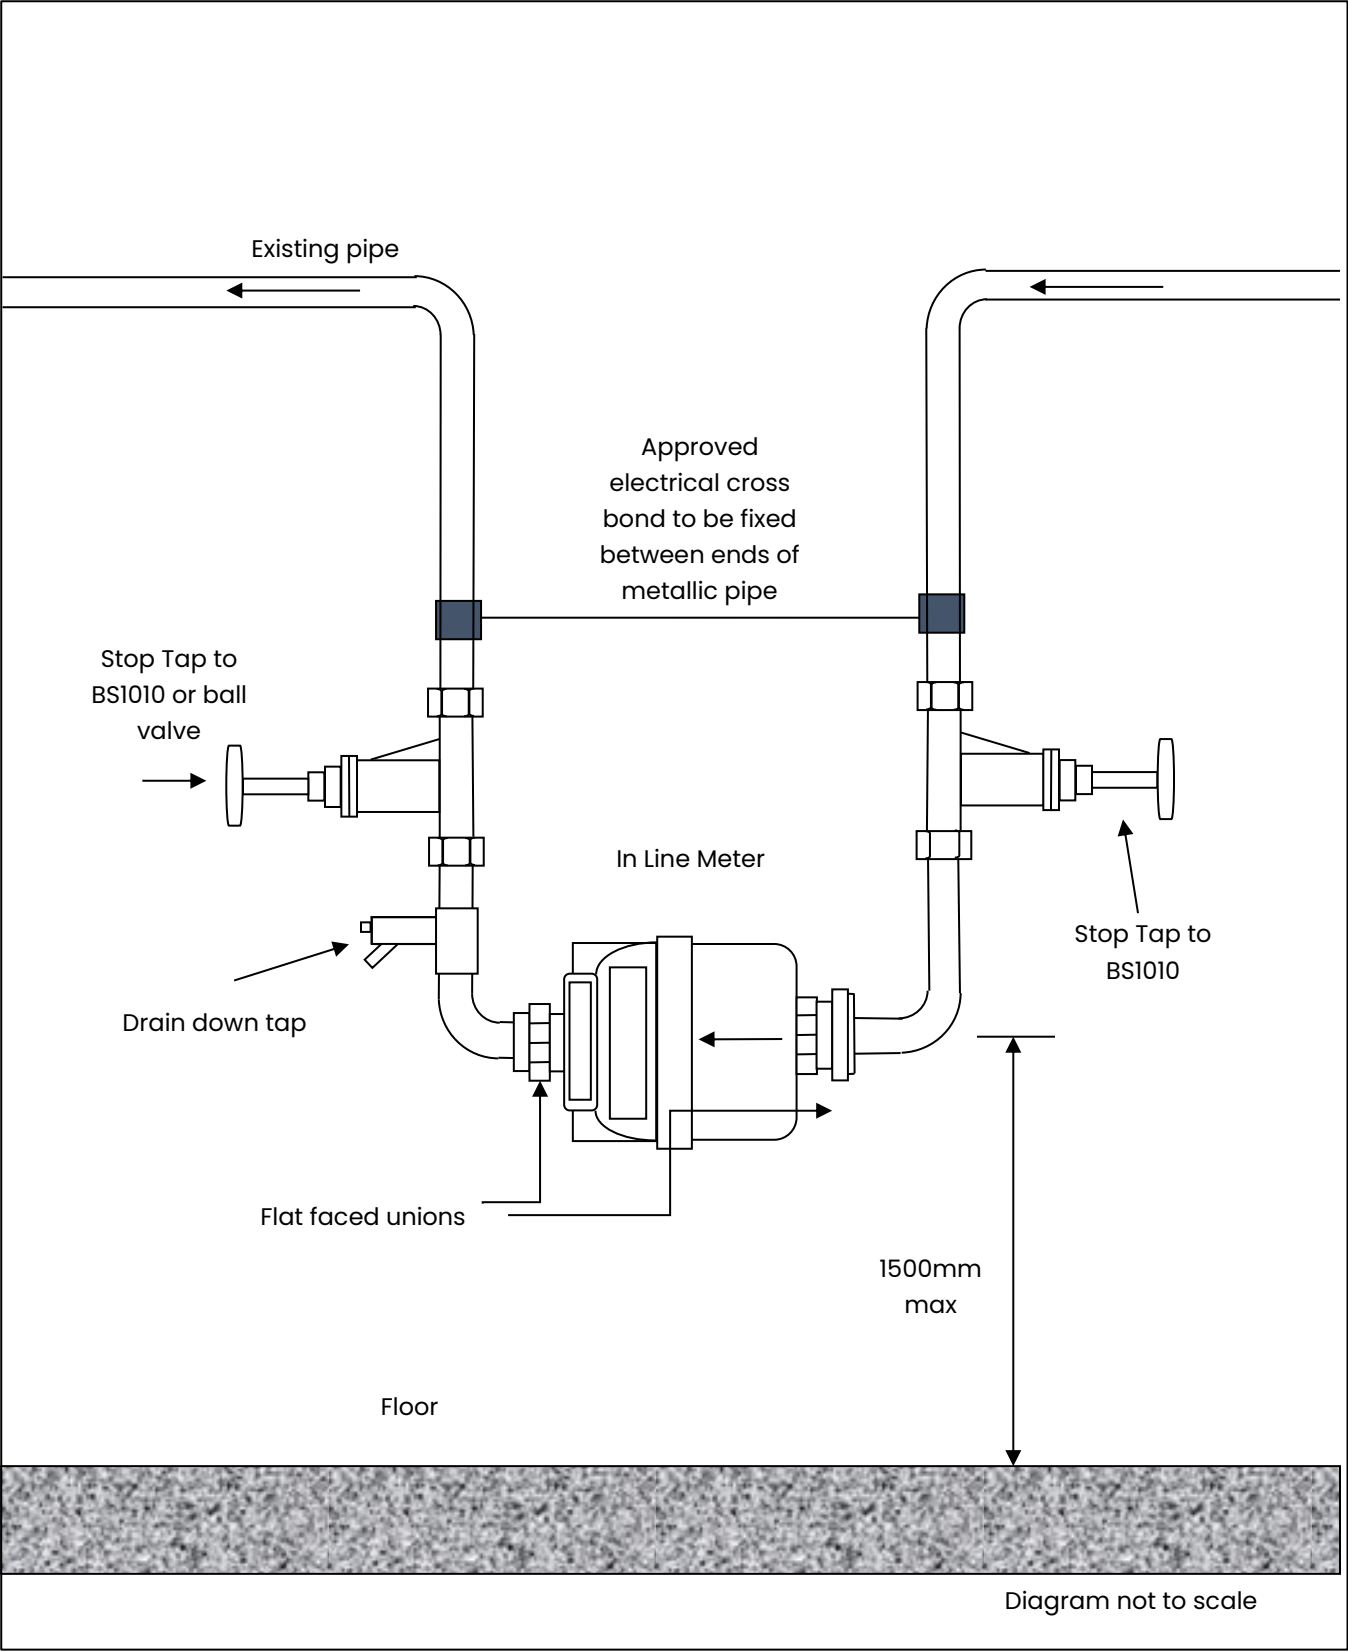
Standard Drawing for an Internal 20 mm – 39 mm Meter Installation Requiring Diversion
